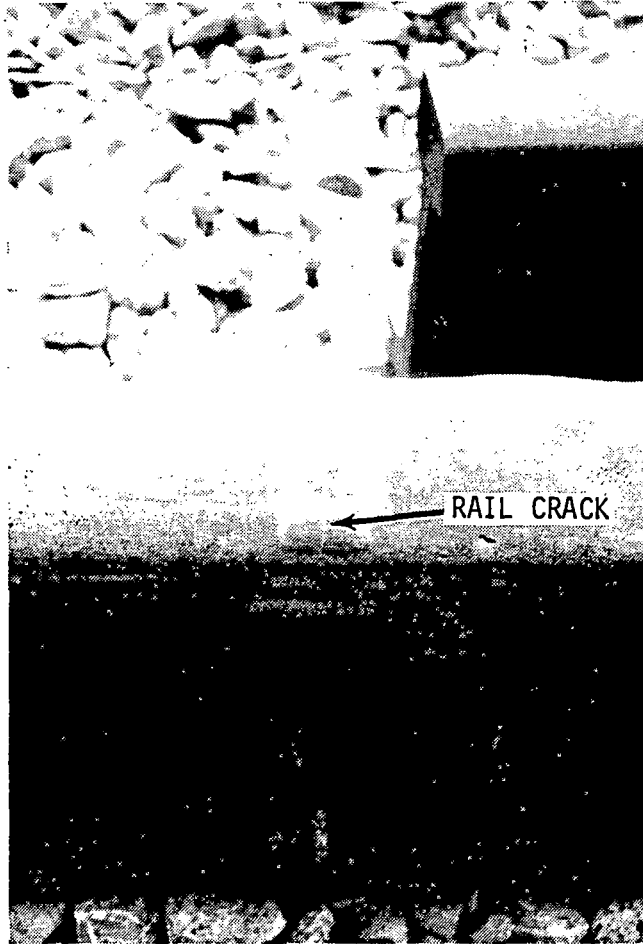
Crack in High Rail in Test Section 3 - Bluefield, WV
